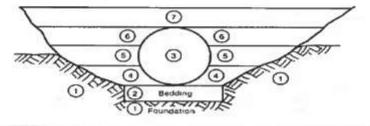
Typical inspector's document for construction control of large corrugated steel pipe structures.
